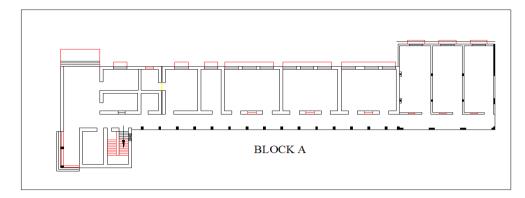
Layout of the school building at Nainbagh in Tehri Garhwal district.
